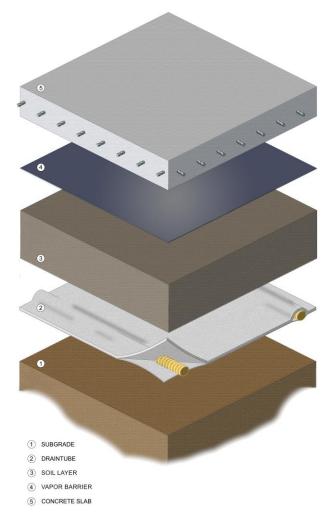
Typical cross section with Draintube[®] and Soil layer
